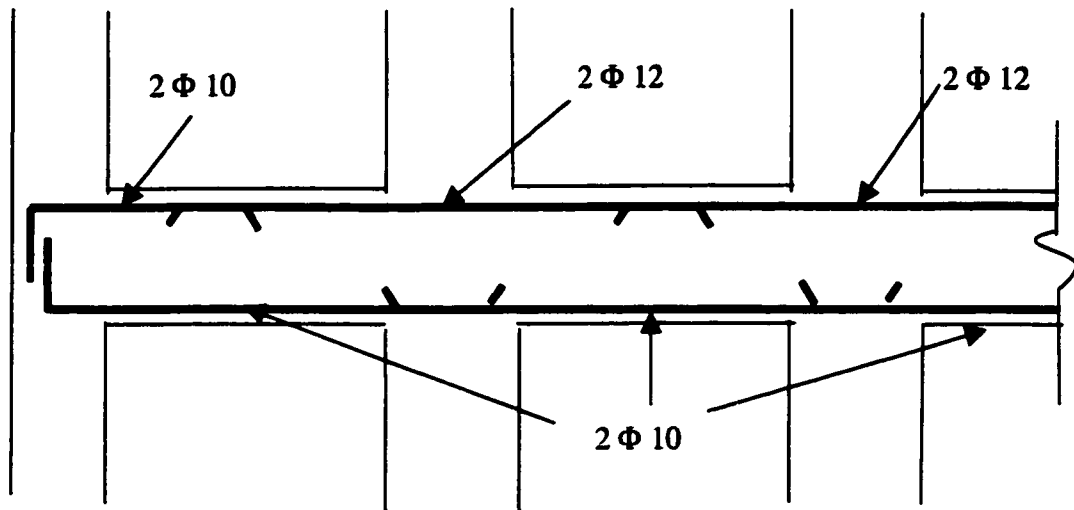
Longitudinal reinforcement in joists⁵⁵
